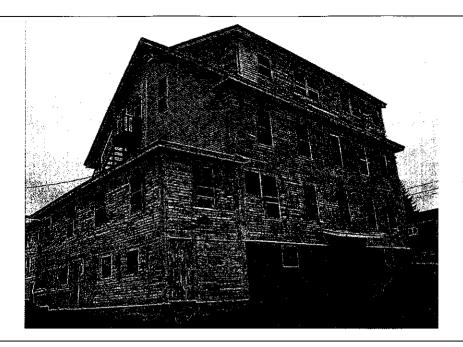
04/27/05 – Men's Annex (Building #15): Front entry elevation.
